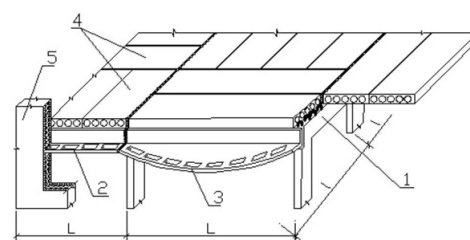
The fragment of the constructive scheme of the building is made of frame house building: 1 – panel-frame; 2 – beam with thermo-connectors; 3 – arch beam with thermo-connectors; 4 – multiple-cavity reinforced concrete floor panel; 5 – wall
